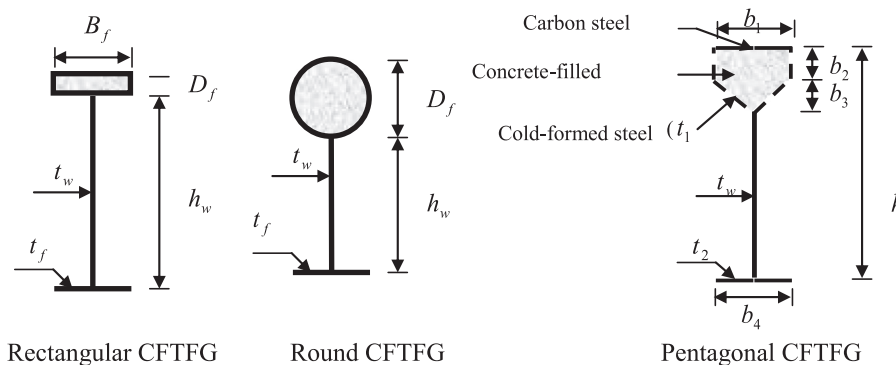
Typical concrete-filled tubular flanges girders (CFTFGs).
